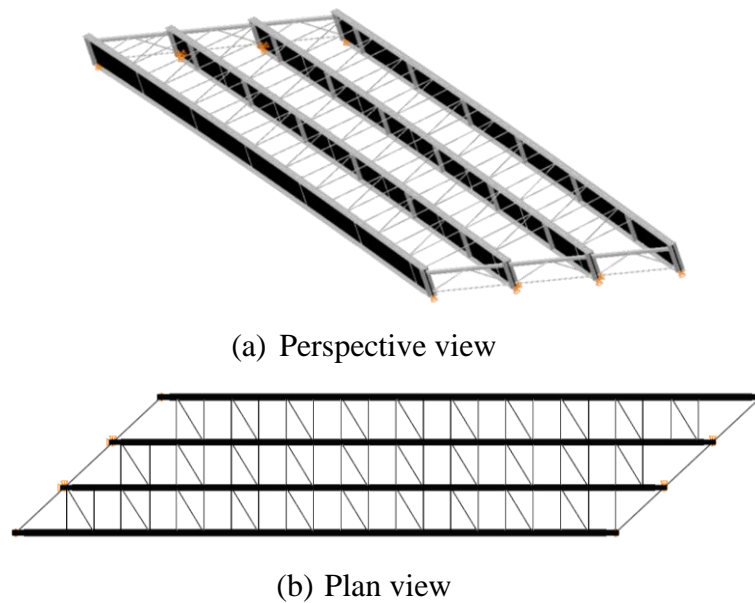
Equivalent truss panels used to model the SIP forms in Bridge EISSS3
